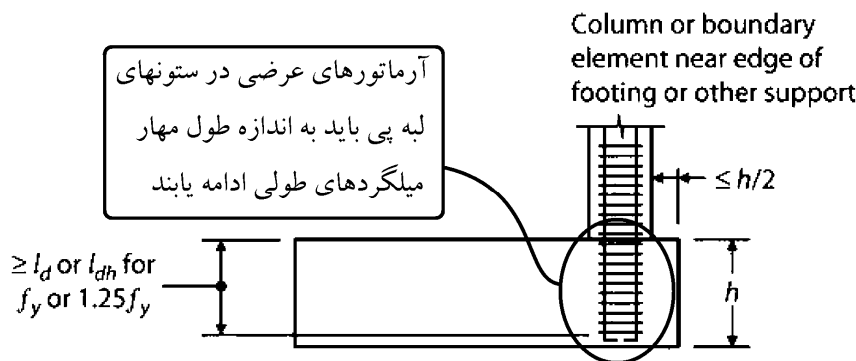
Required extensions of column and boundary element reinforcement into footings, mat foundations, and pile caps.
